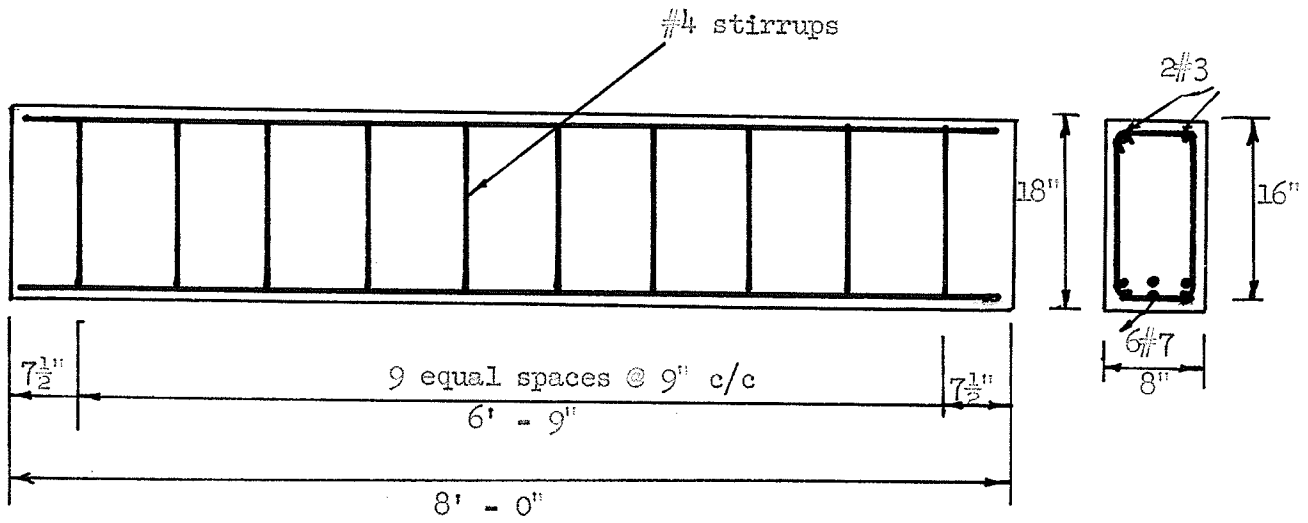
SKETCH OF REINFORCEMENT BEAM 1
